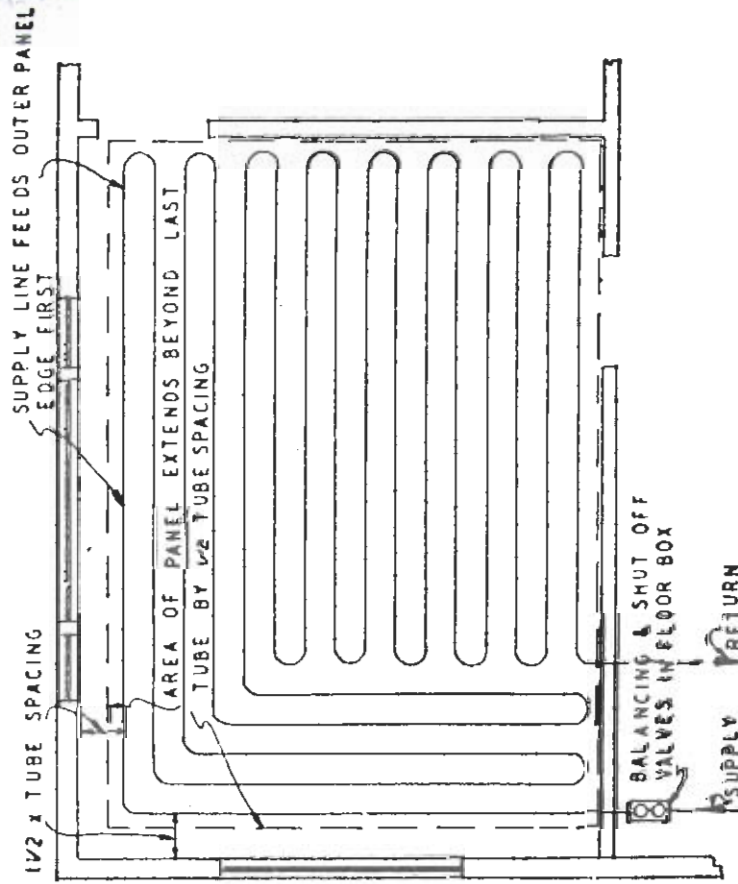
Typical piping diagram for floor radiant panel. Installation of hot water coils in floor slabs usually vary little from this typical layout. There is a latitude regarding the depth of burying the coils, but the important thing is to observe that the tubing be all on one level to prevent air pockets and to facilitate drainage. No provision need to be made for different coefficient of expansion of materials as long as tubing be contained in one solid slab. Where slabs are separated by expansion joints and tubing runs from one to the other, a 1/2 inch felt wrapping extending one inch from face of each slab will ordinarily absorb movements due to expansion.
